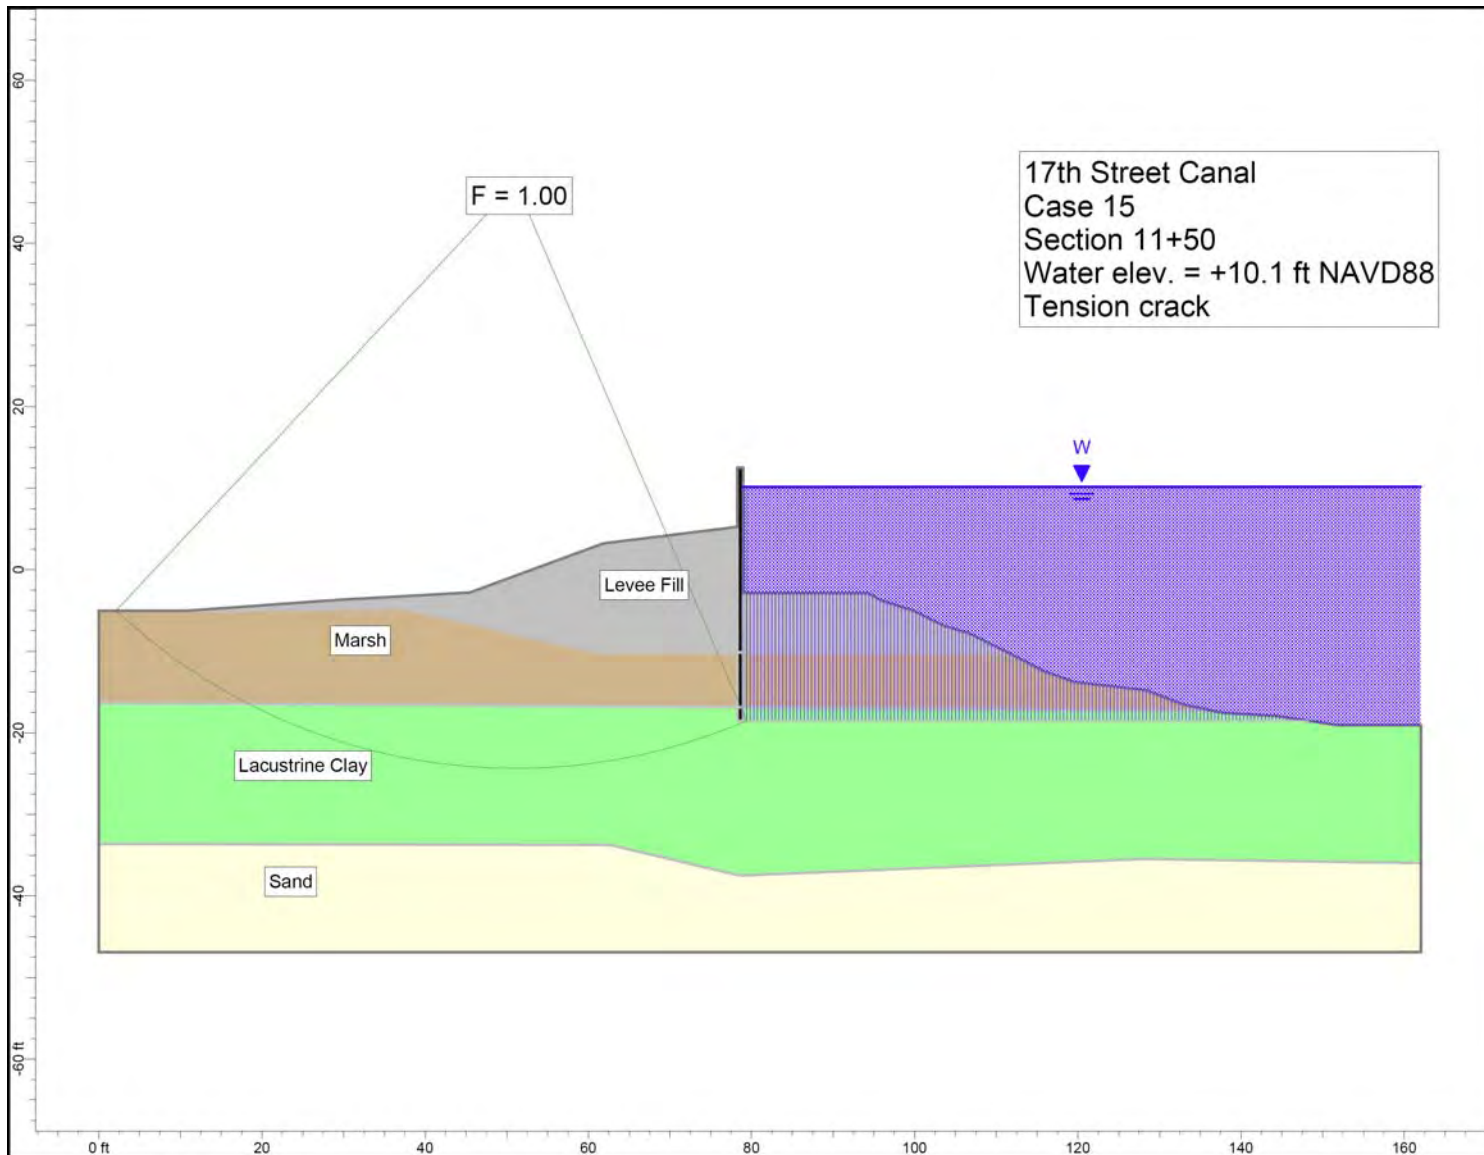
Critical Circle for 17th Street Canal Station 11+50 – Water Elevation 10.1 ft, Tension Crack
